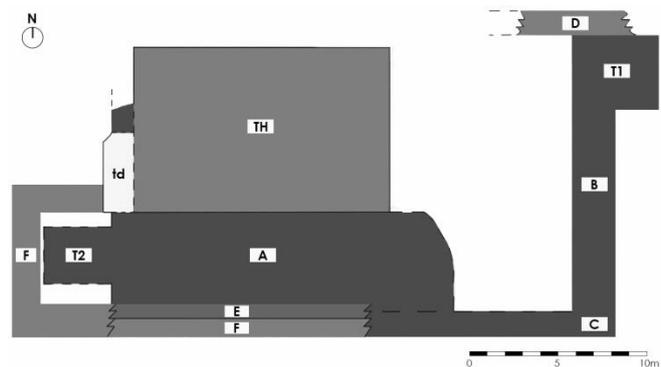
Plan of the keep with surrounding wall remains (Source: Gutiérrez López et al., 2015, p. 76)
